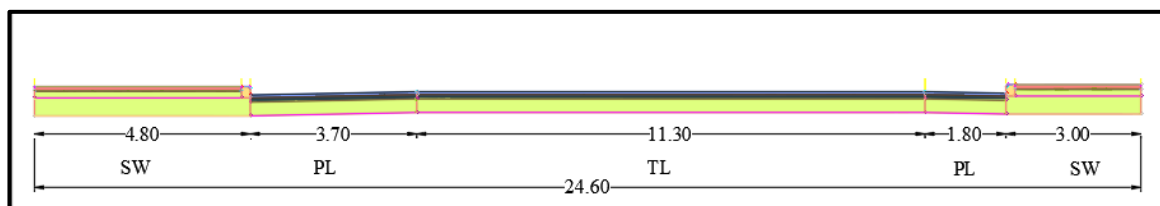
At Ibn Qutaiba School, Section No.2 Existing Cross Section
